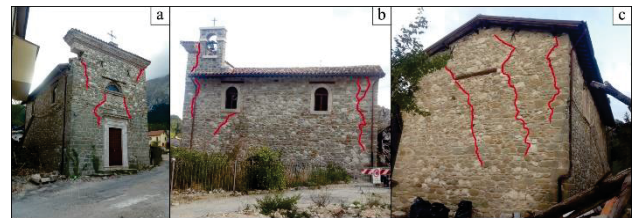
Cracks of Santissimo Crocifisso's Church after the seismic sequence of 2016 on the main façade (a), the north façade (b), the back façade (c)
